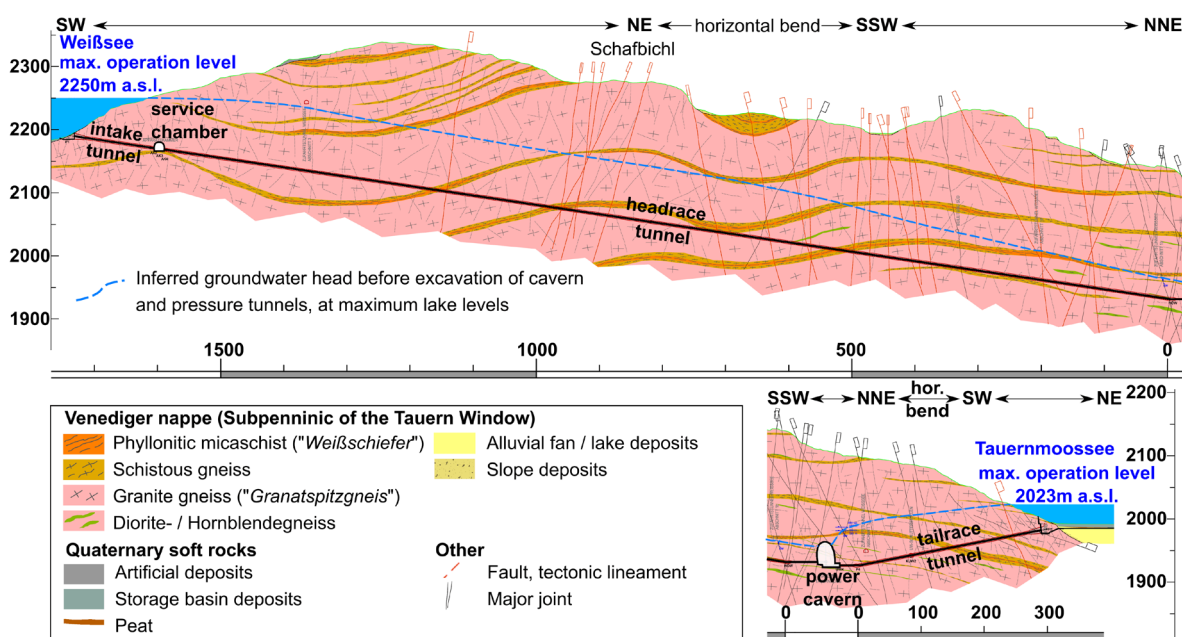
Geological cross-section along the headrace and tailrace tunnels.
